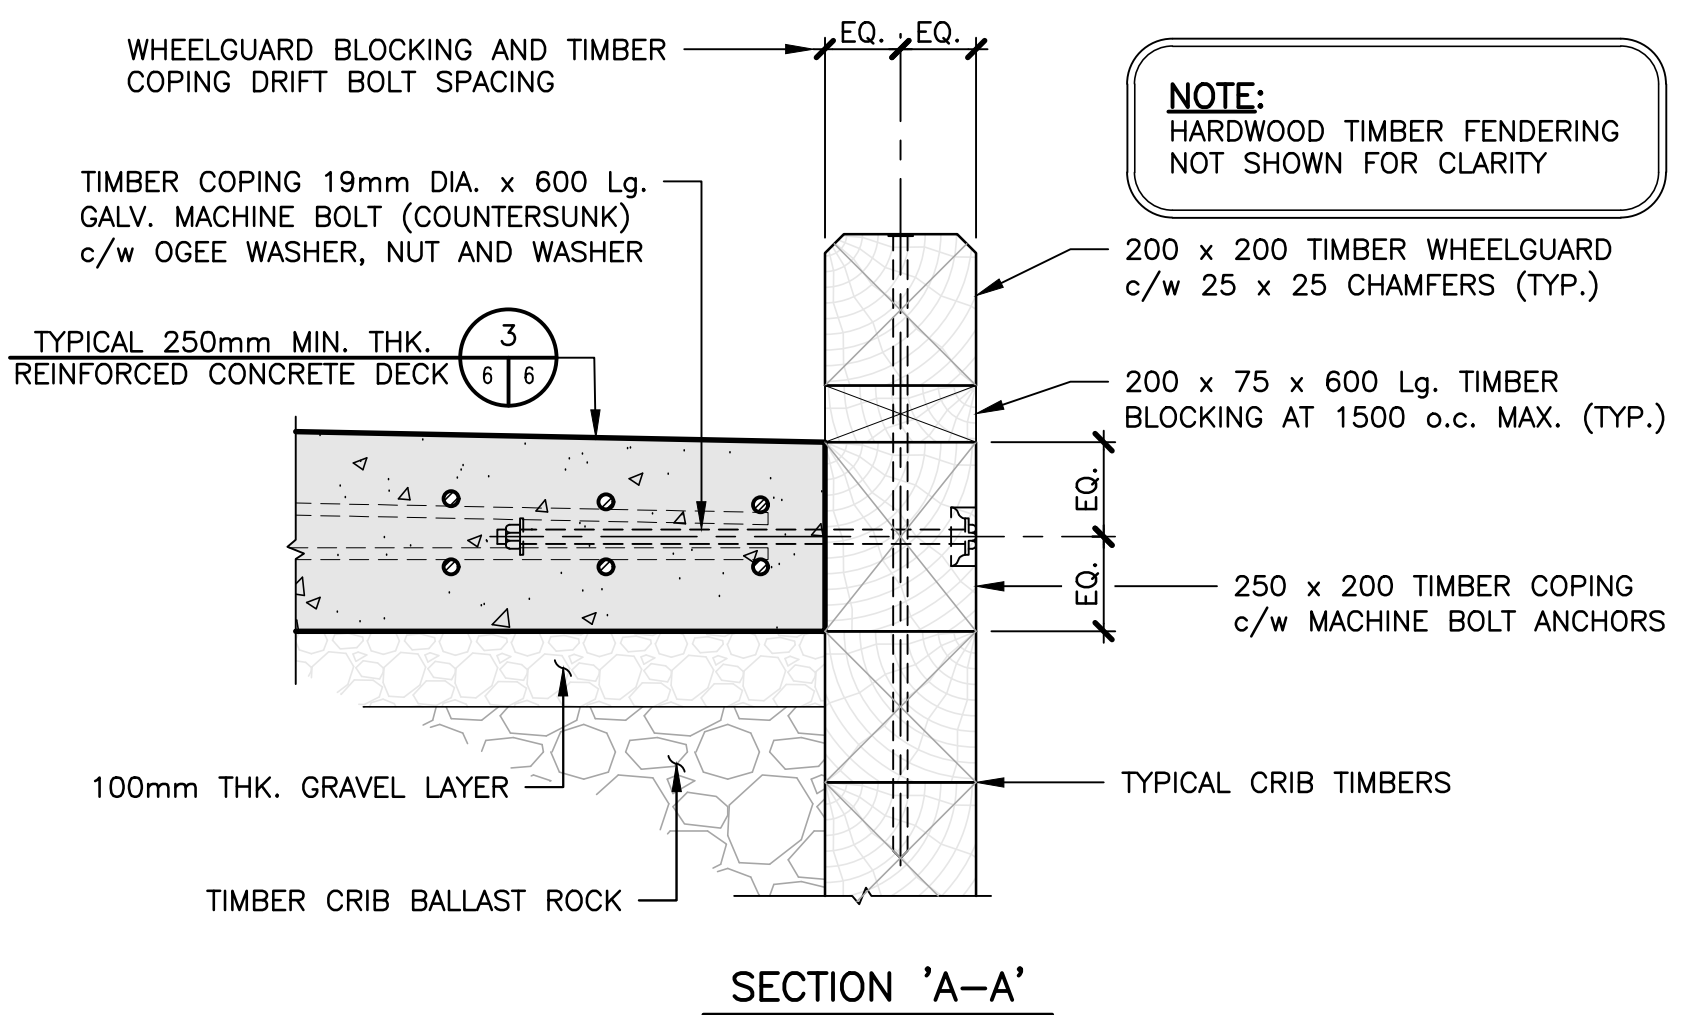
DETAIL - TYPICAL REINFORCED CONCRETE DECK
